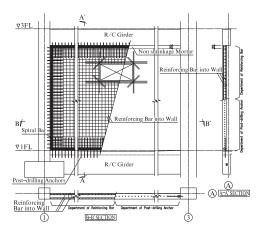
Example of seismic retrofit in reinforced concrete (RC) structure (Additional bearing wall)
